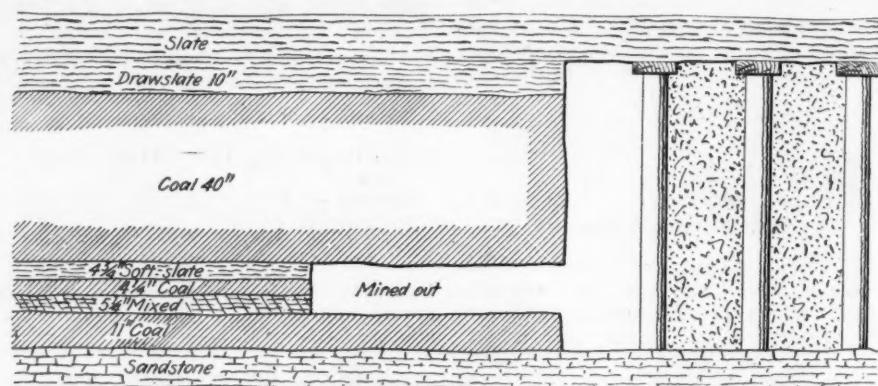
Rubbish in Seam Is Partly Cut Out and Partly Removed by Powder or Bar. Upper and Lower Benches Are Then Loaded
